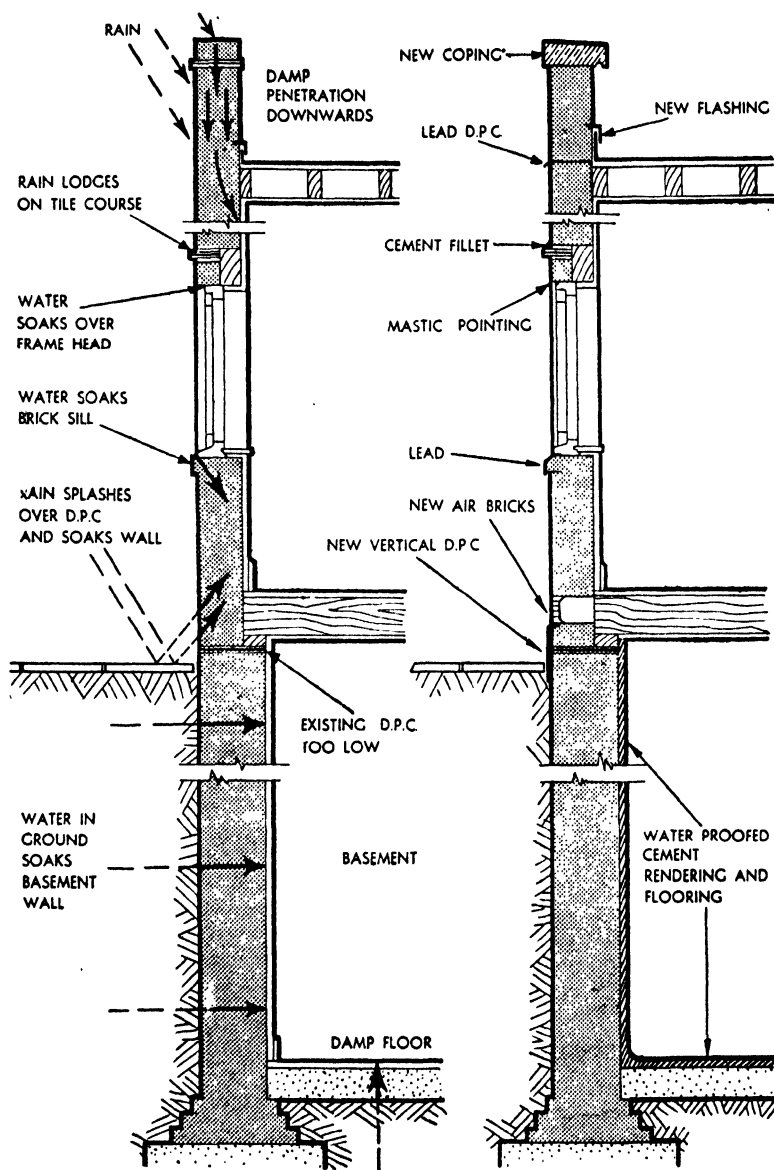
Treatment and repair of defective wall details. (Left) Wall as existing and (right) the same wall after it has been repaired. Note the horizontal d.p.c., which prevents water from soaking down the wall. The new coping has a weathered top and is throated on the underside to enable the water to drip off.
